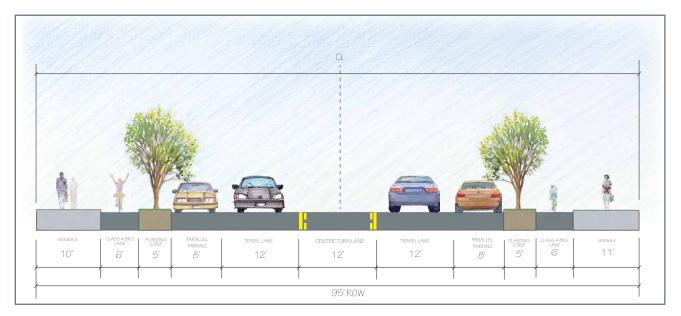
Farmersville Blvd Option 3- Cross Section (downtown area - Ash Street to Costner Street)
